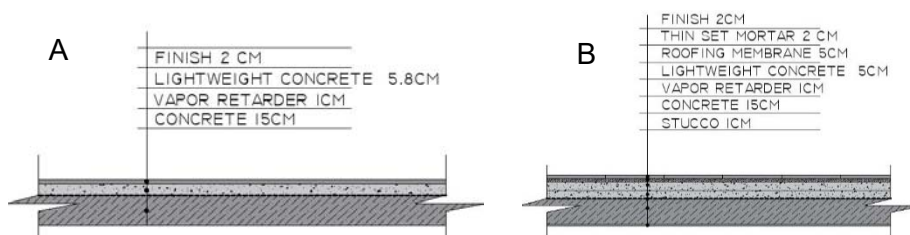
Details of the existing roof (A) and the proposed roof (B) in Tirana and Shkodra (source: the authors, extracted from the AutoCAD software, 2021)
